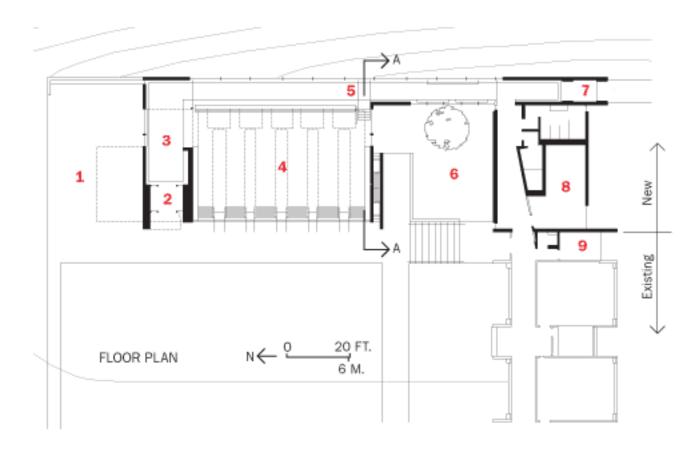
Bigelow Chapel floor plan 1. North garden4. Sanctuary7. South entry2. West entry5. Processional Hall8. Mechanical3. Narthex6. Meditation garden9. Office
